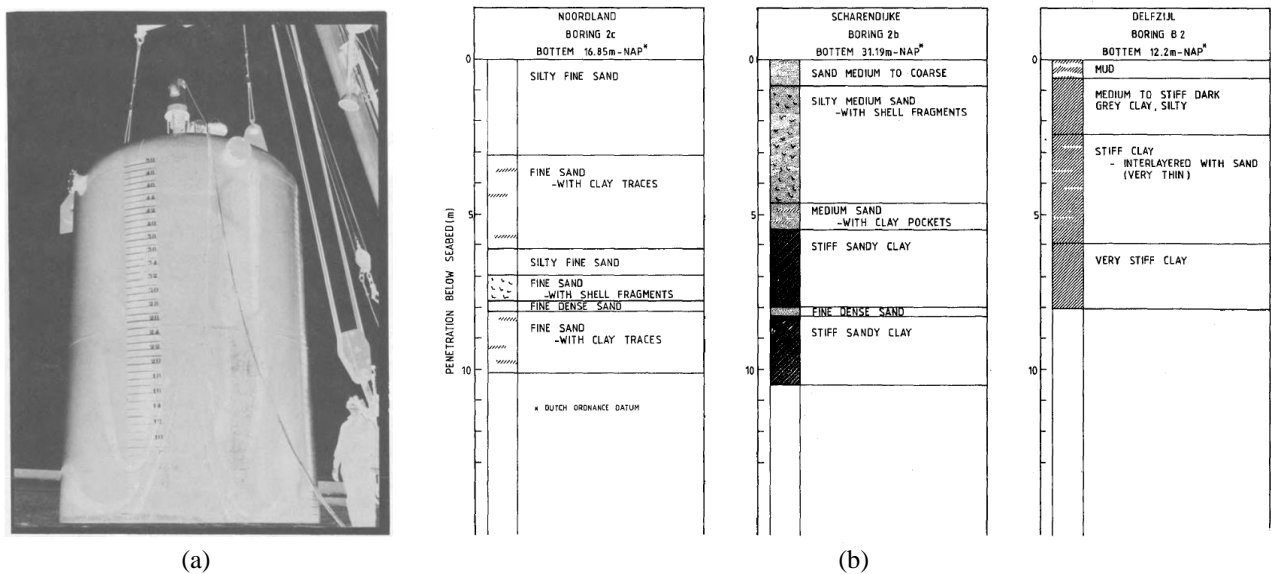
(a) Suction anchor pile (b) Soil profiles of test sites
